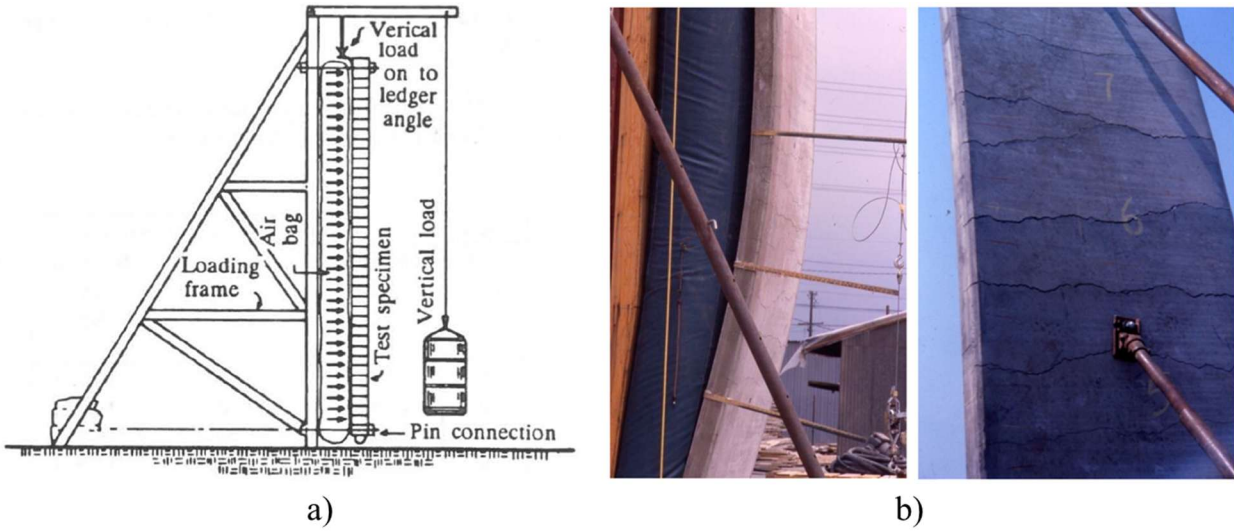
Experimental basis for out-of-plane wall fragilities: a) Static air bag apparatus (Adham et al. 1988); b) Example wall specimens during out of plane testing (Lawson and Lai, 2010).
